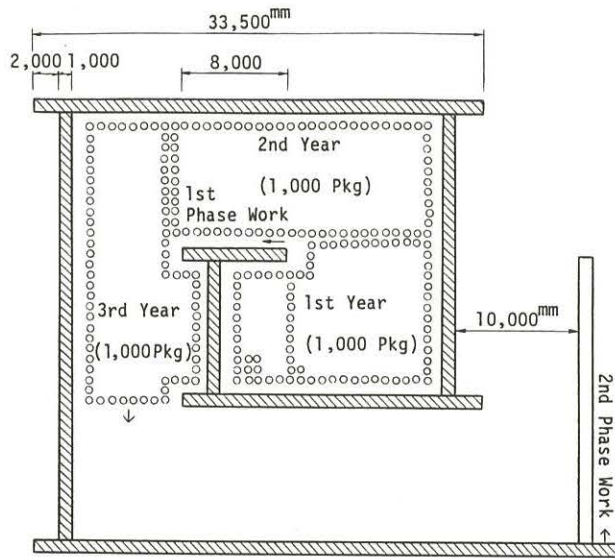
CONCEPTUAL DRAWING OF PLANE OF PROPOSED SYSTEM
